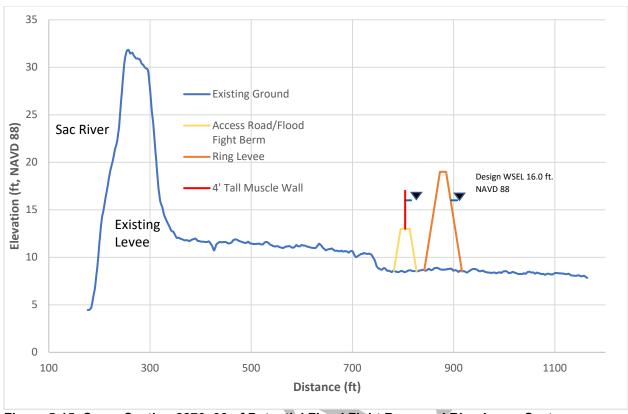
Cross Section 2876+00 of Potential Flood Fight Berm and Ring Levee Systems
